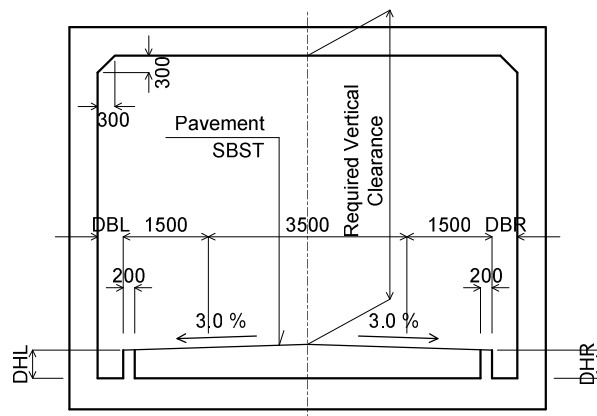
Detail of Box Culvert Internal Clearance for Class-D Road
